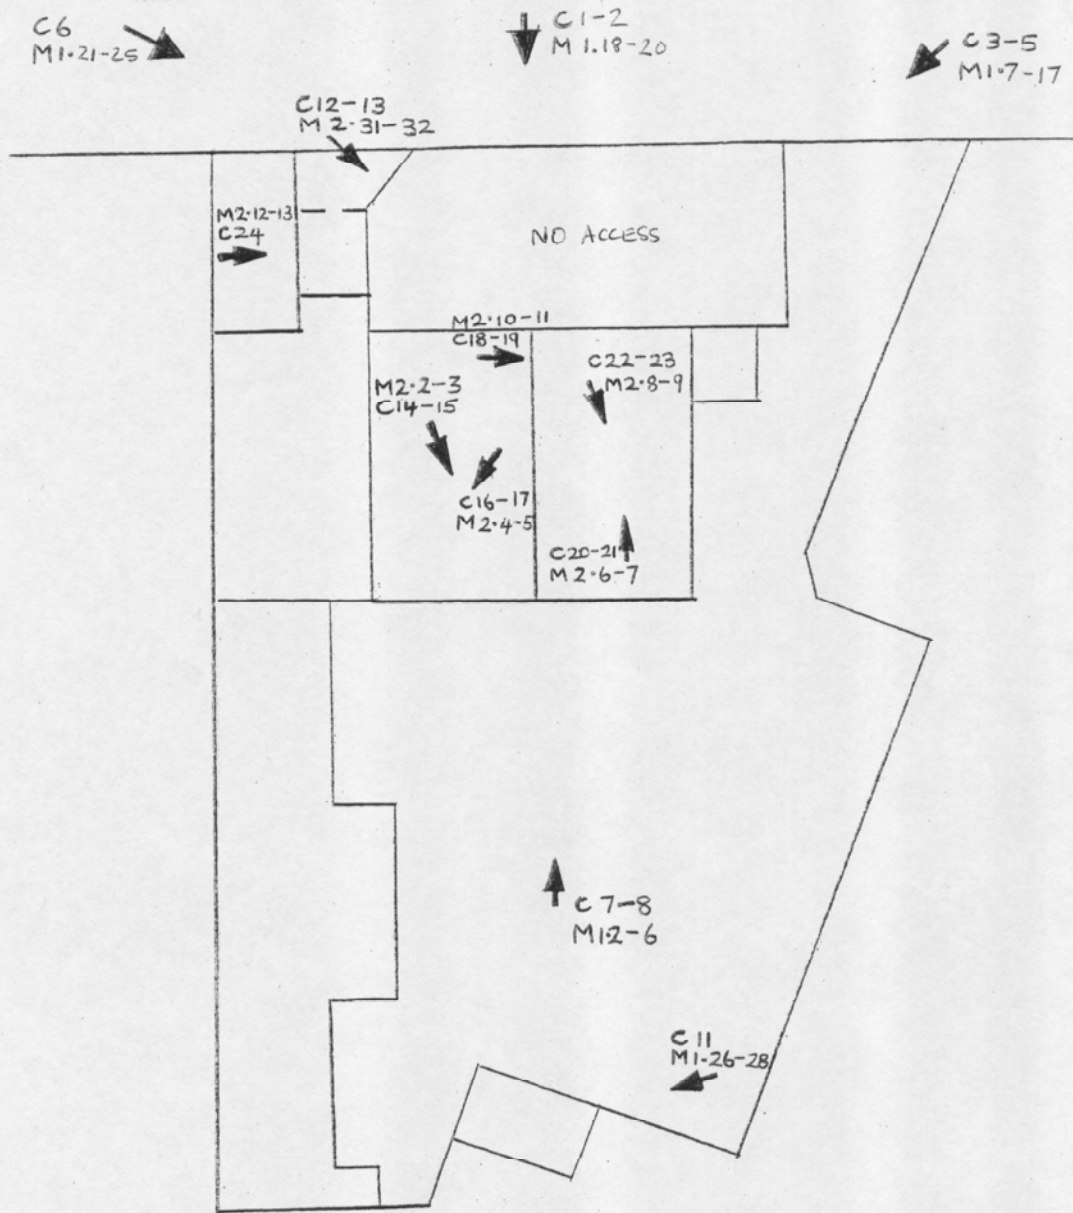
Photo locations/orientation. Ground Floor. Not to Scale.
